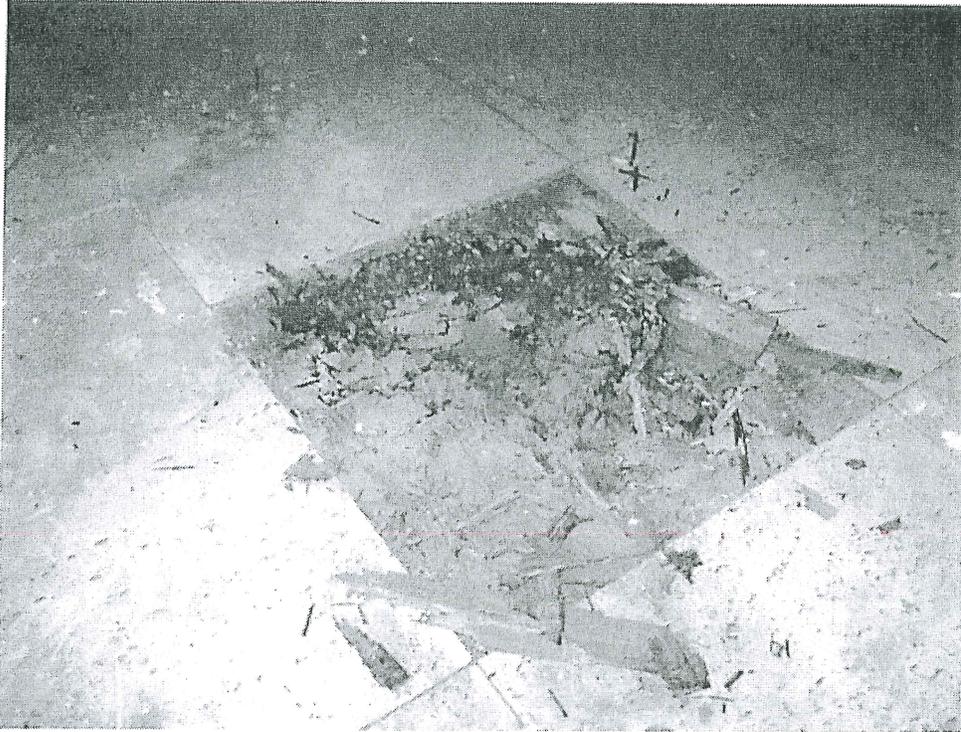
Water damage to the first floor deck near the entry
